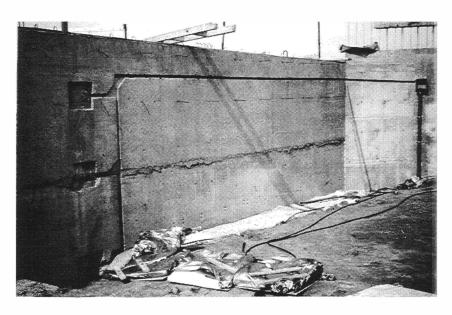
Blockouts on Back of Abutment Wall for Total Pressure Cells and Tubing
